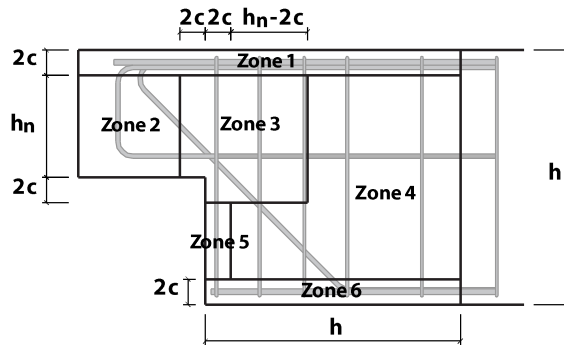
Example of zonation within a half-joint detail to facilitate inspections
